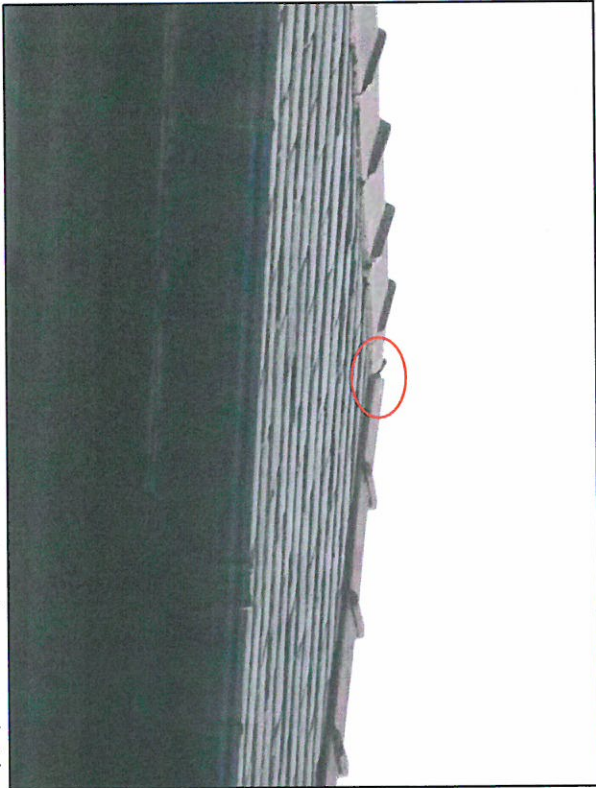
Dislodged ridge tiles on western elevation where central ridge meets hipped tiles.
